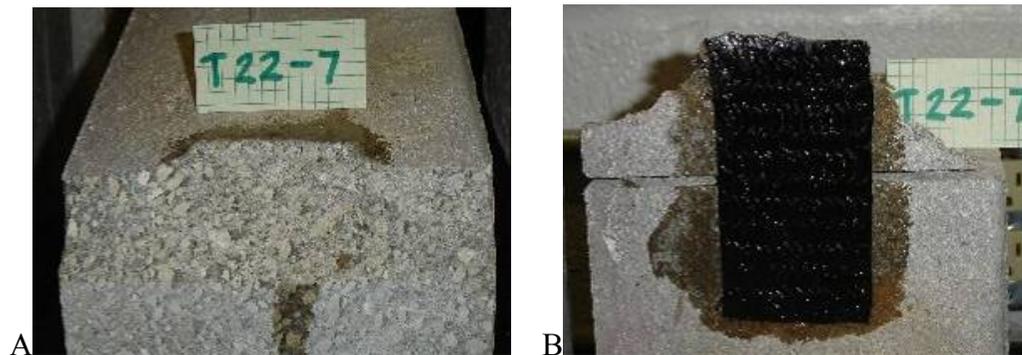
Interfacial failure caused by short CFRP A) concrete failure surface B) CFRP failure surface
